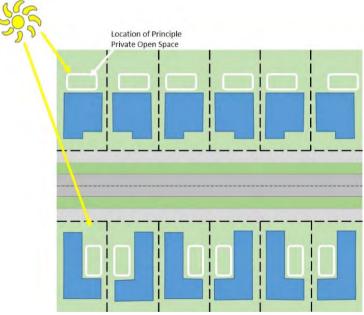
ORIENTING LOTS TO ENSURE NORTH FACING PRINCIPLE PRIVATE OPEN SPACE
